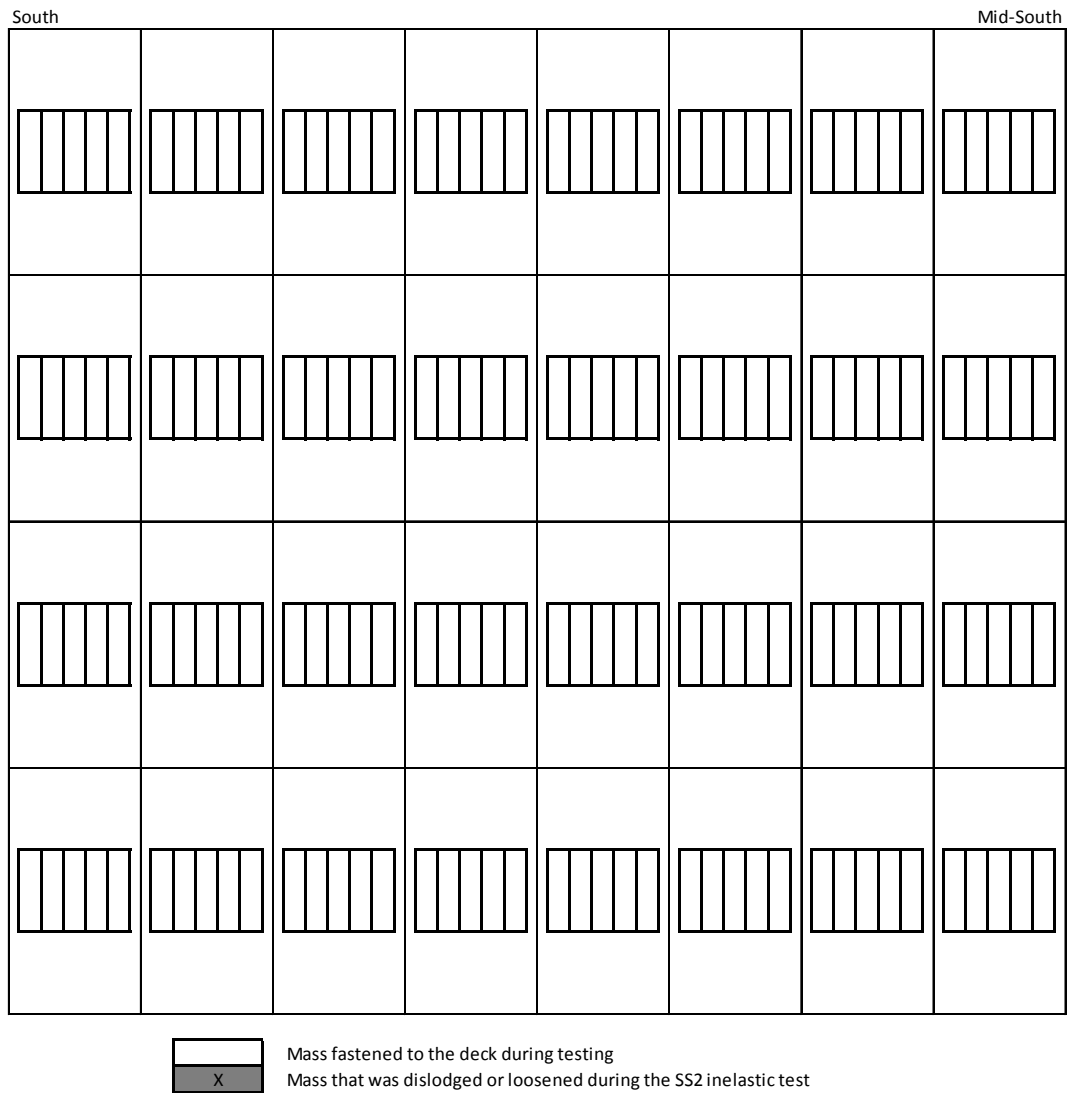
DIA15: Fastener failures during inelastic test (2/5)
